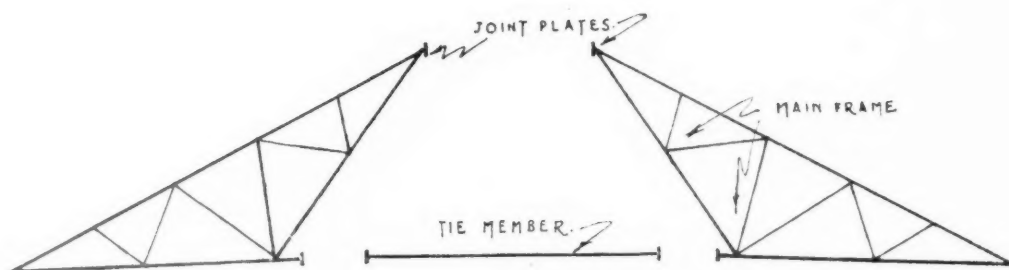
Composite roof truss for spans ranging from 15' to 40'.
